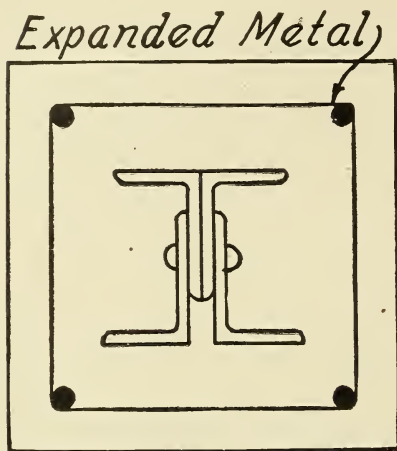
Column for Erben-Harding Building, Philadelphia, Pa.
